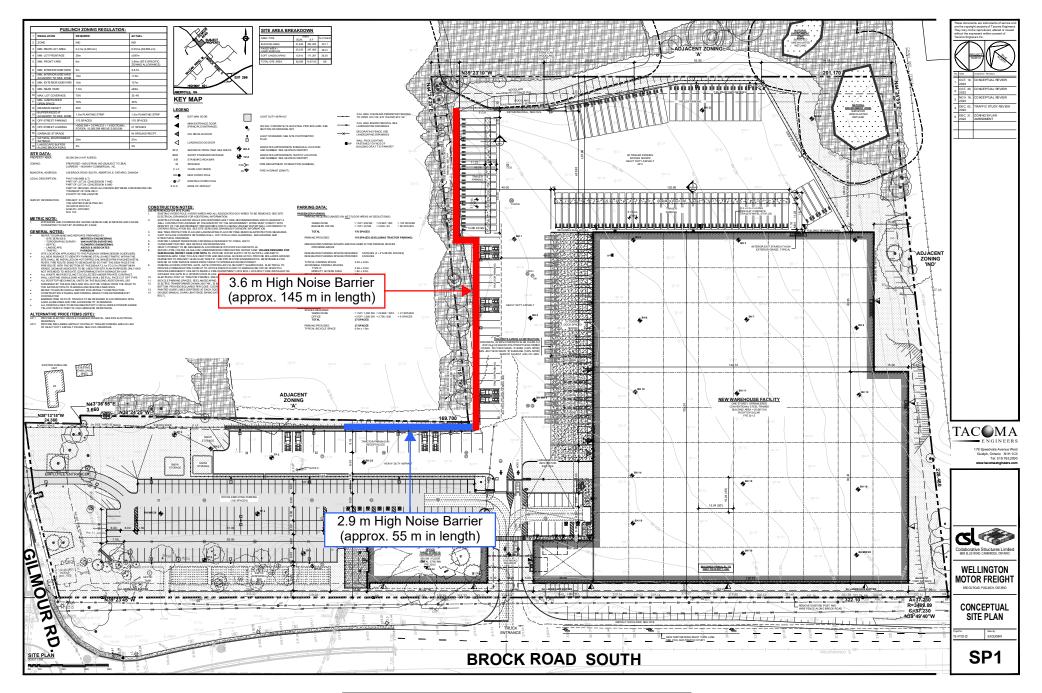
Proposed Site Plan Showing Noise Barrier Location
